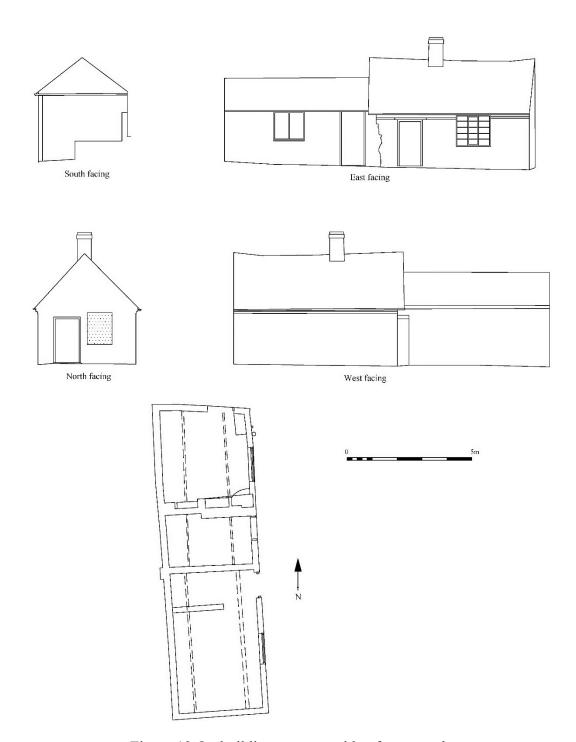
Outbuildings on west side of courtyard Modified from plans supplied by client
